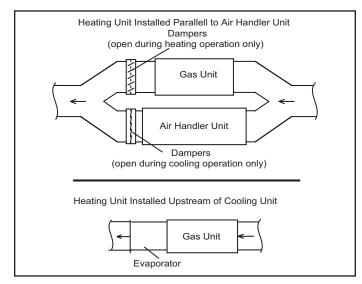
Heating Unit Installed Parallel to Air Handler Unit
